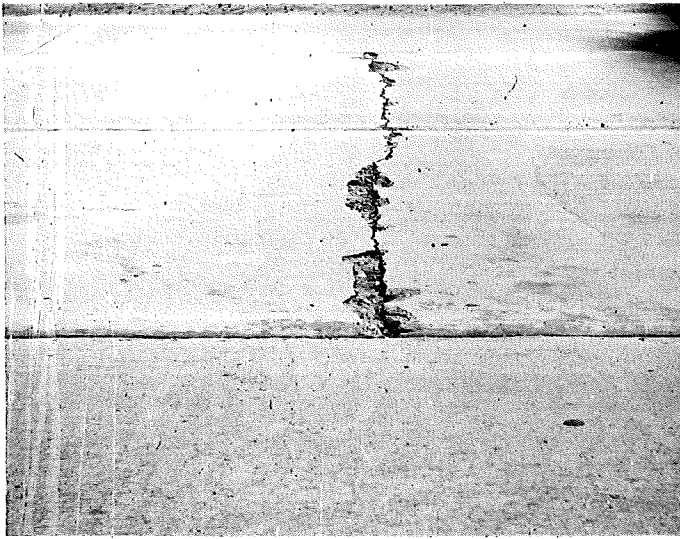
SPALLED CRACK AT STATION 344+37
